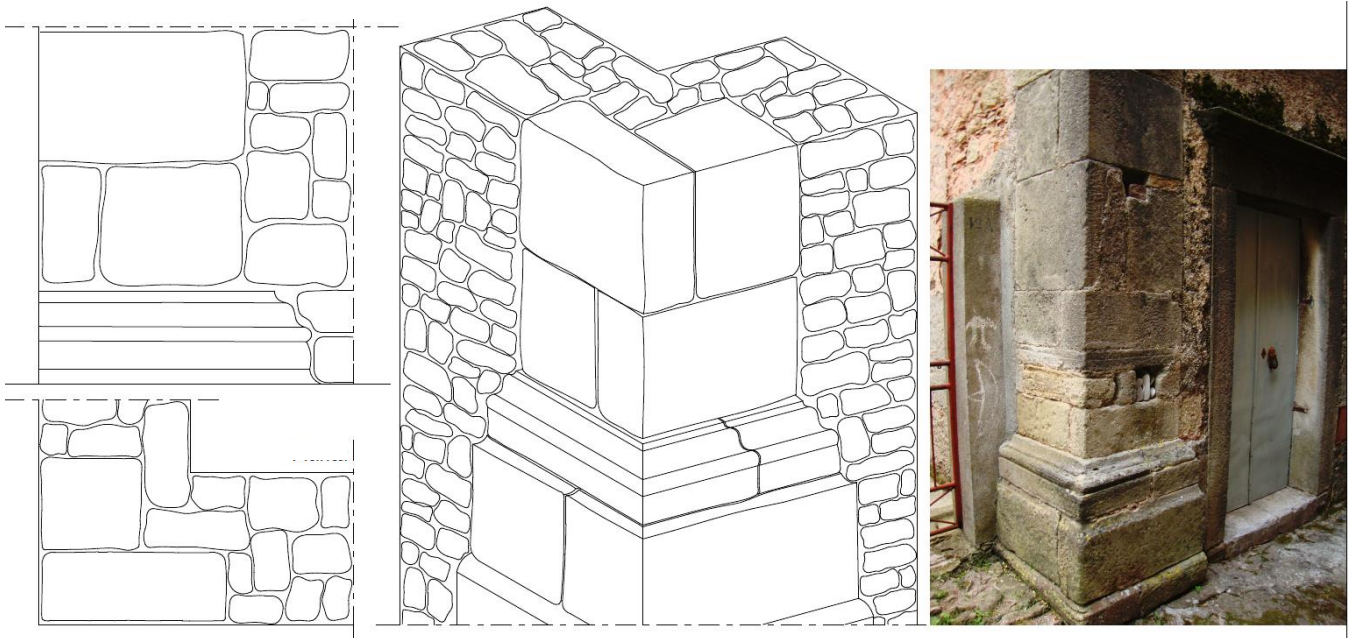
AF. Ashlar masonry realized with Fuscaldo sandstone, Fuscaldo (CS). Stone masonry with ashlar and ornamental stone elements to strengthen building corners.
